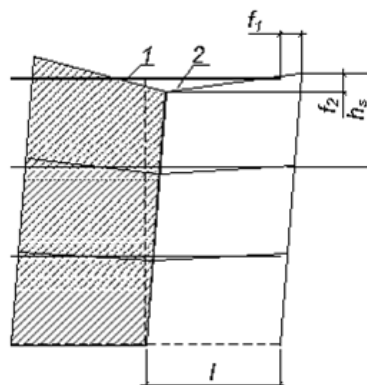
Scheme of skew of floor cells (2) adjacent to stiffness diaphragms (1) in buildings with a connected frame (the dotted line shows the frame diagram before the application of the load)
